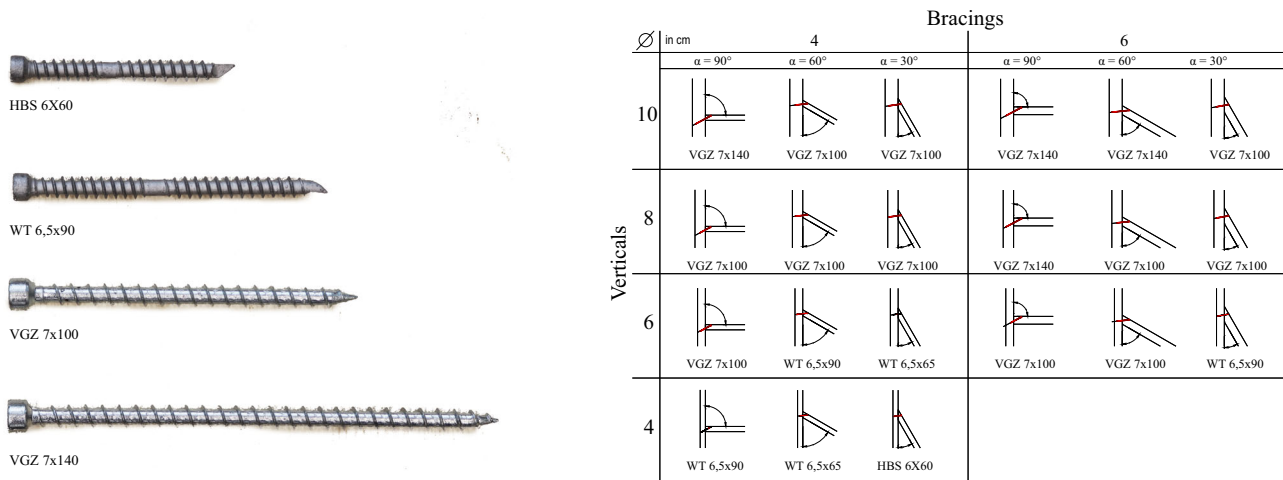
Left Different types of full-threaded screws used for the joints. Right Calculation of screw type, length, and angle depending on corresponding geometry and material thickness
